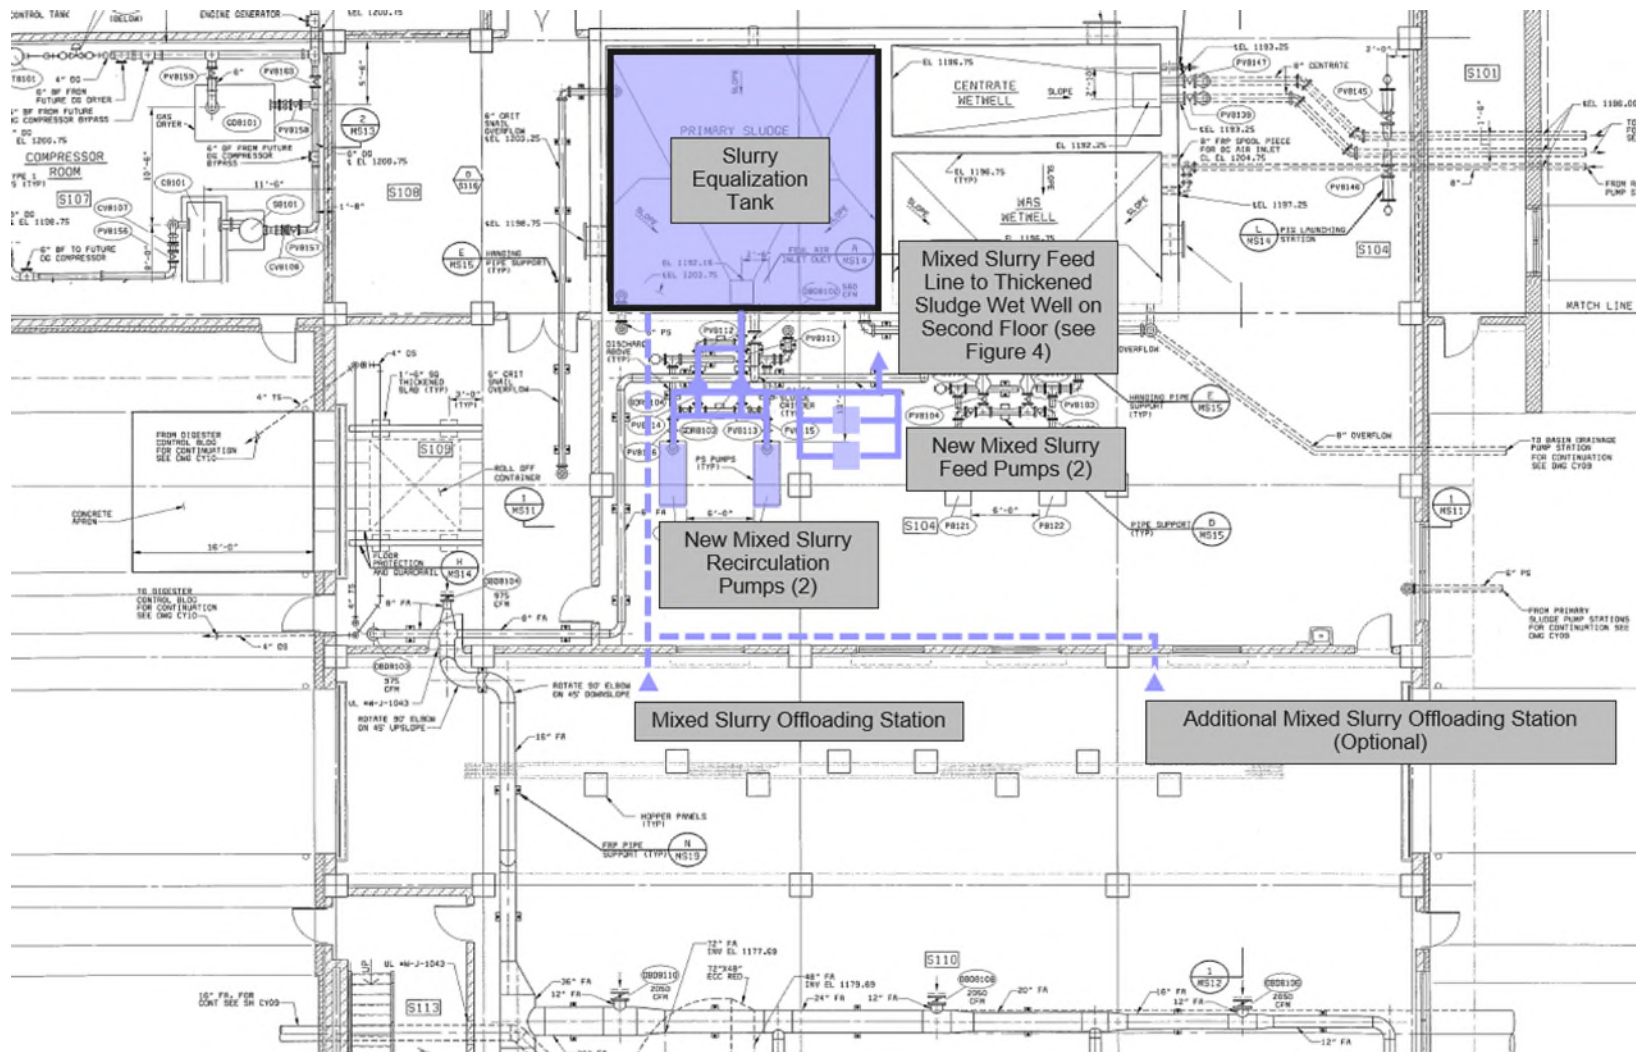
Direct Equalization Tank Feed Alternative: Mixed HSW Organic Slurry Offloading and Rehabilitating the Existing Primary Sludge Wet Well Layout (Solids Building, First Floor)
